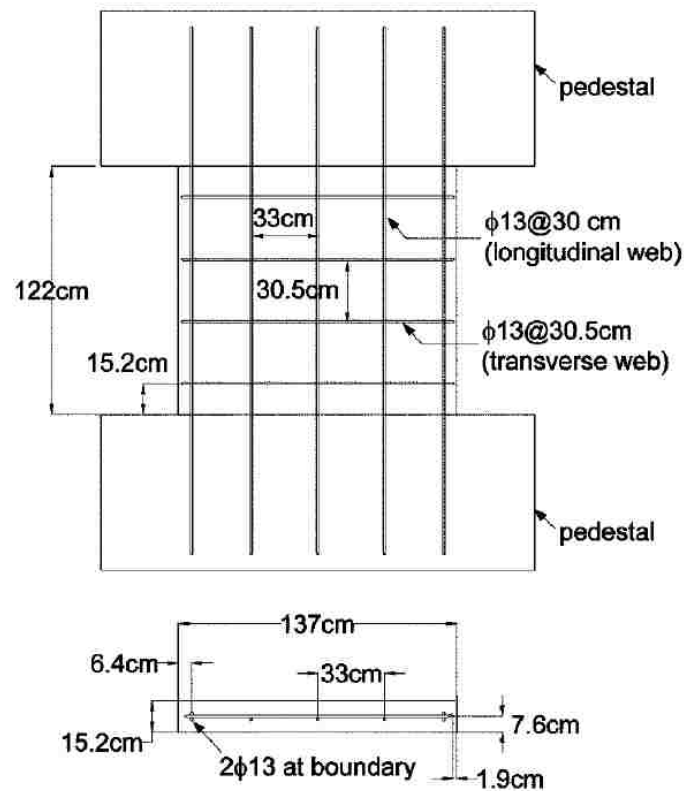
Massone Wall Pier (WP) Specimen (dimensions in cm) (Orakcal et al.,2009)
